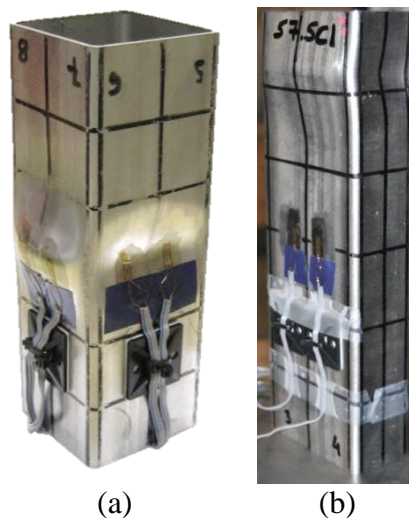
Stub column failure modes: Specimens (a) SHS 60×60×2-SC1 and (b) RHS 80×40×2-SC1
